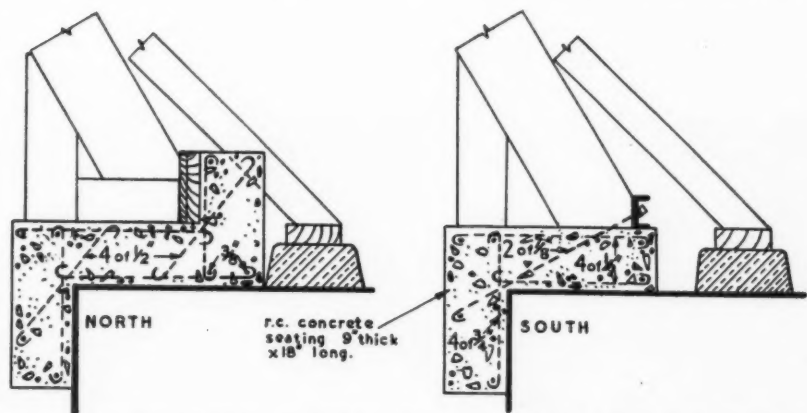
Roof truss details. Reinstatement after dry rot eradication at St. Patrick's Cathedral, Dublin.
